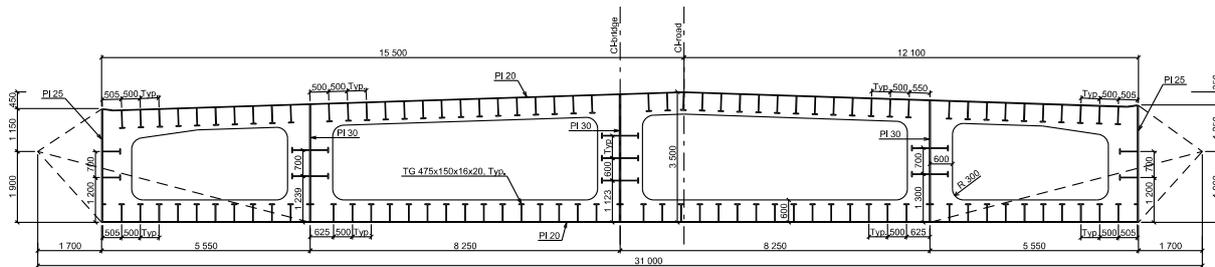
Strengthened bridge girder section at bridge ends at abutment South (truss bracing of cross stiffener not shown).
